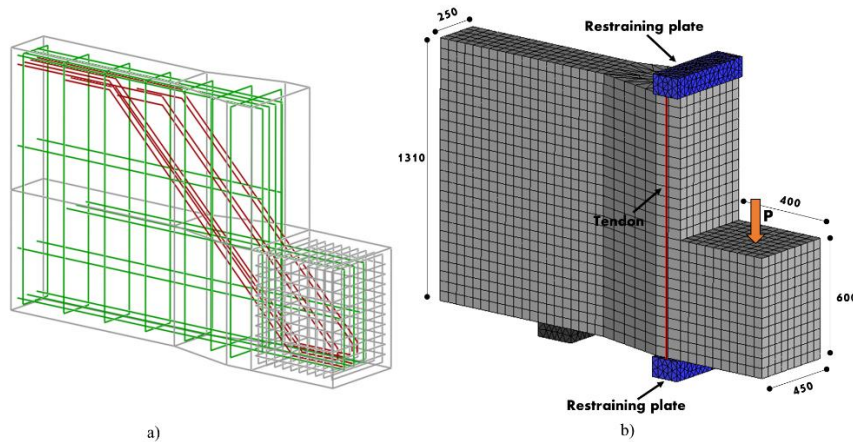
(a) Half-joints' reinforcement layout; (b) FEM model with intervention (dimension in mm).
